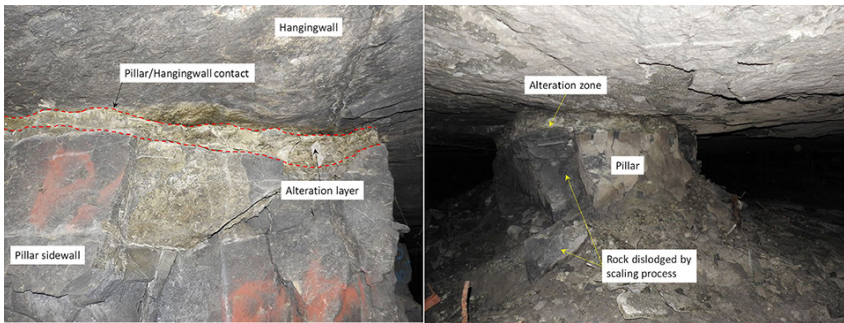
Failed pillars at Everest Platinum Mine (Malan and Couto, 2023b)
